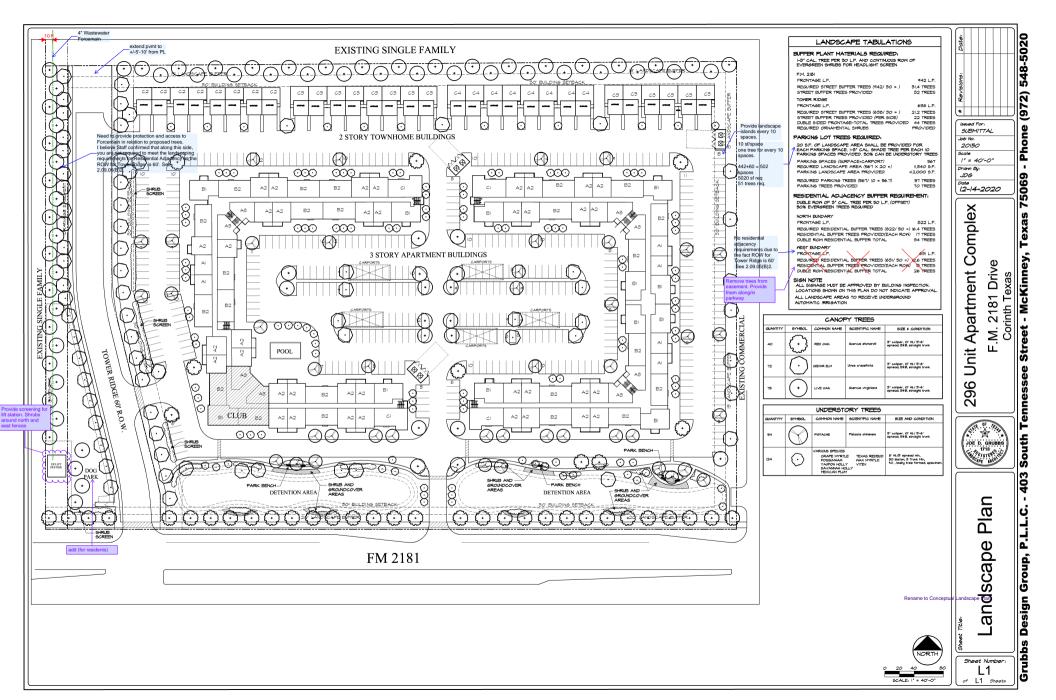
EXHIBIT "B" LANDMARK AT TOWER RIDGE MULTIFAMILY AND TOWNHOUSE PD MASTER PLAN PD DESIGN STATEMENT
